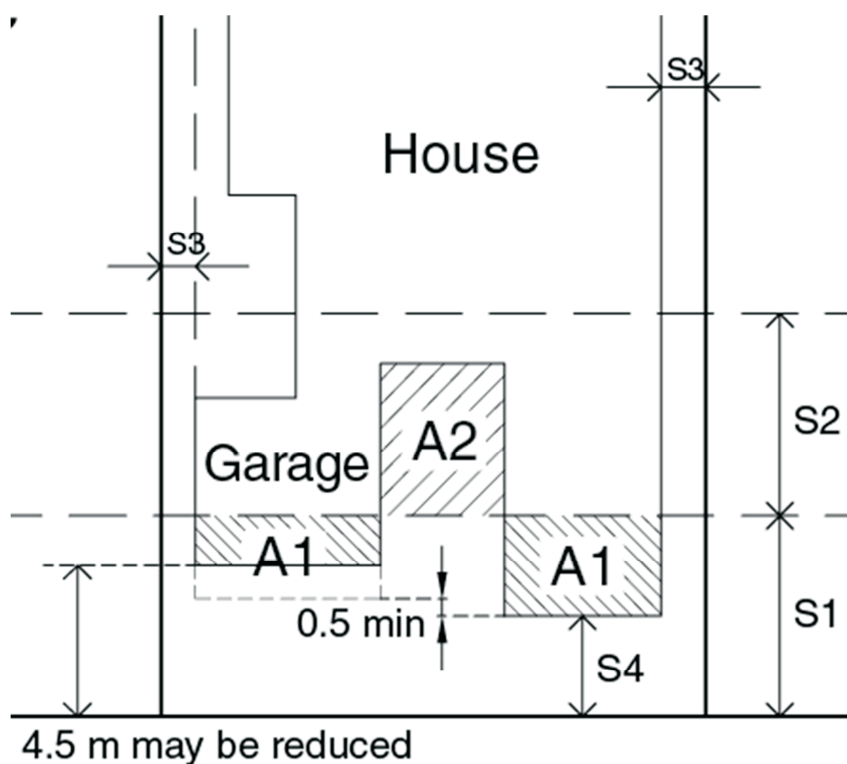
Measuring primary street setbacks (clause 5.1.2, C2.1iii)
